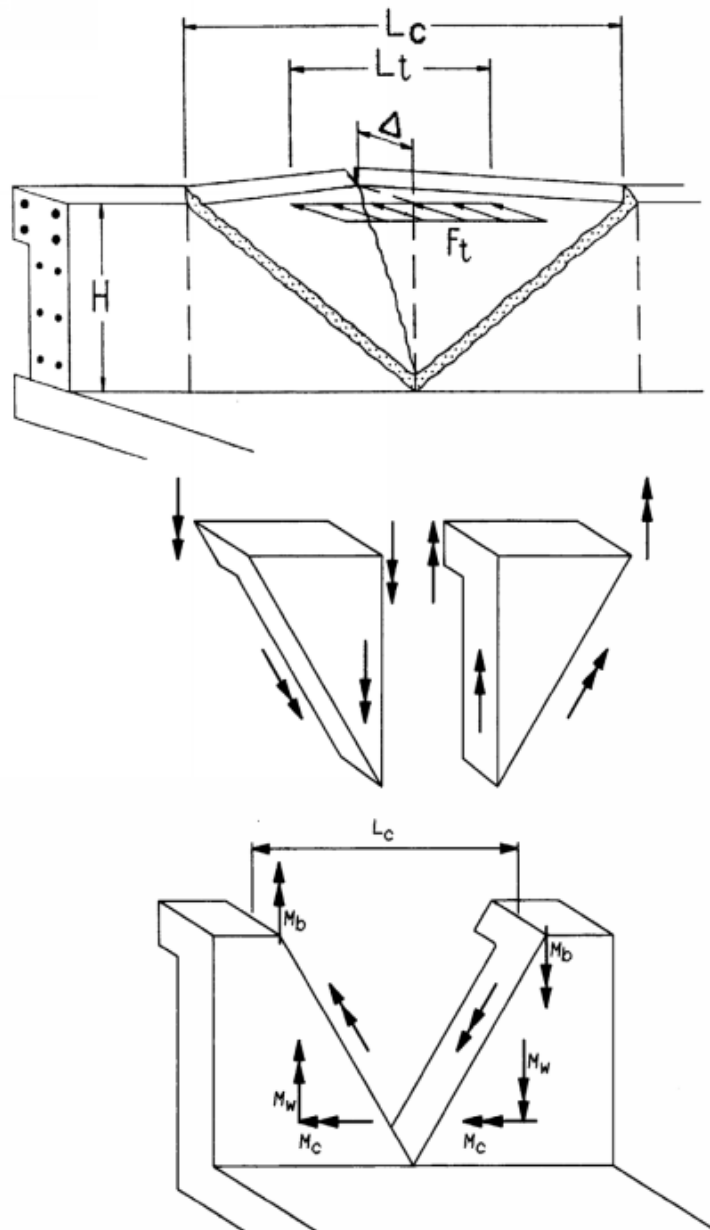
Yield Line Analysis of Concrete Parapet Walls for Impact within Wall Segment
